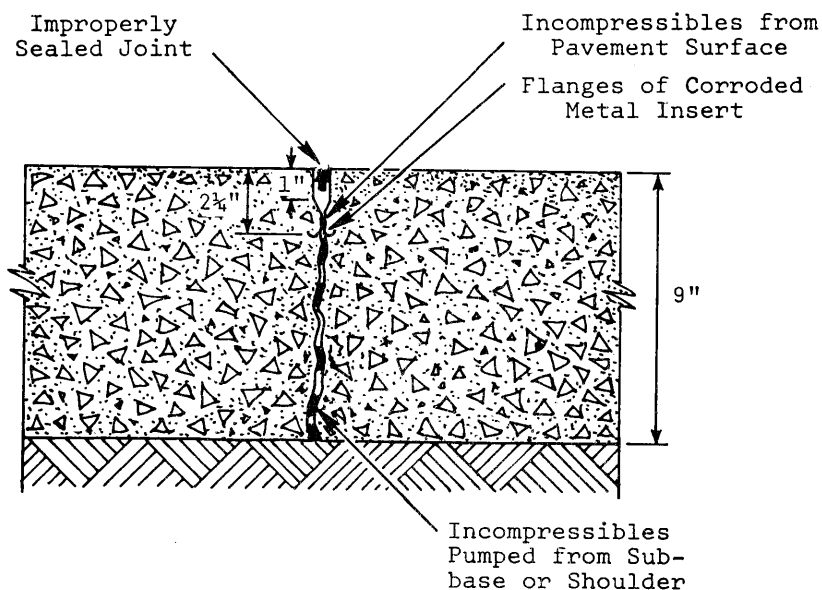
Transverse contraction joint with infiltration from pavement surface, shoulder and subbase.
